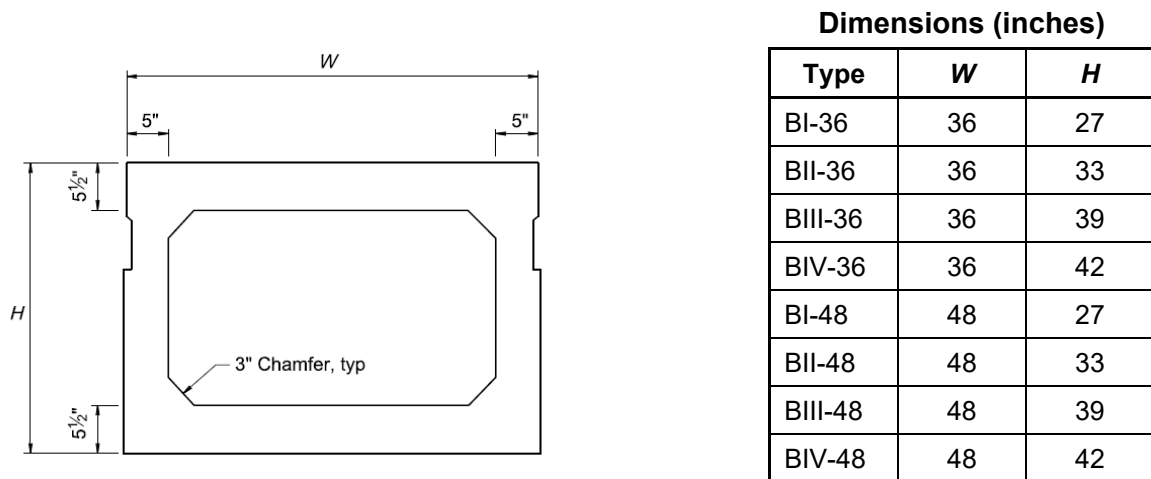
Precast Box Girders (PCI, 2014)
